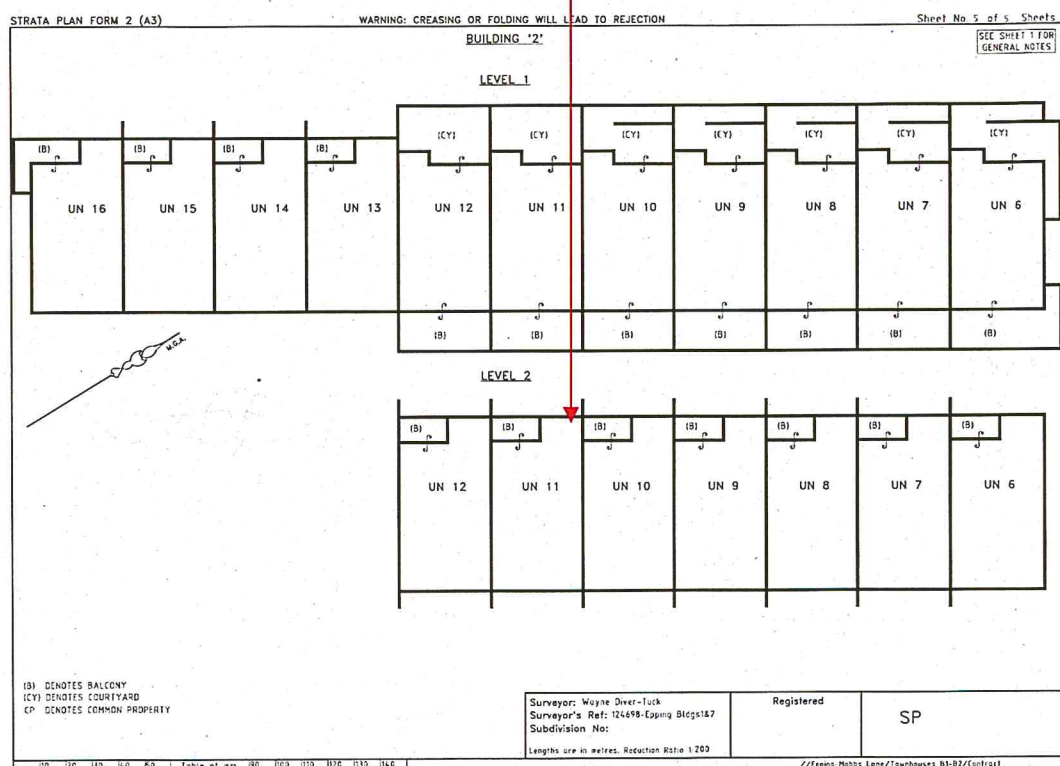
Building '2' Level 1 and Level 2 proposed strata subdivision plan.
